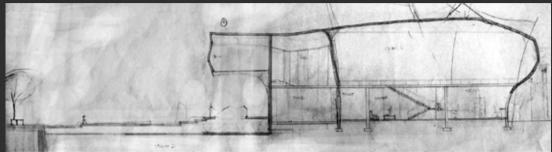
sectional sketch exploring the ground floor open air stage with relation to the proposed Contemporary Dance Company and the proposed public square.
